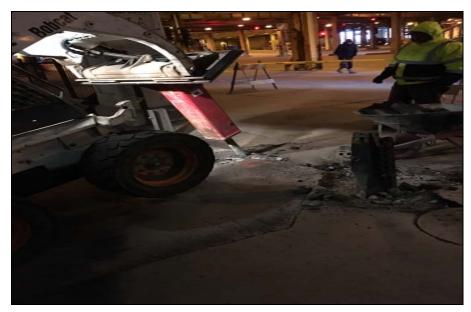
View facing southwest of Hole A concrete removal. Old rail in foreground to be removed.
